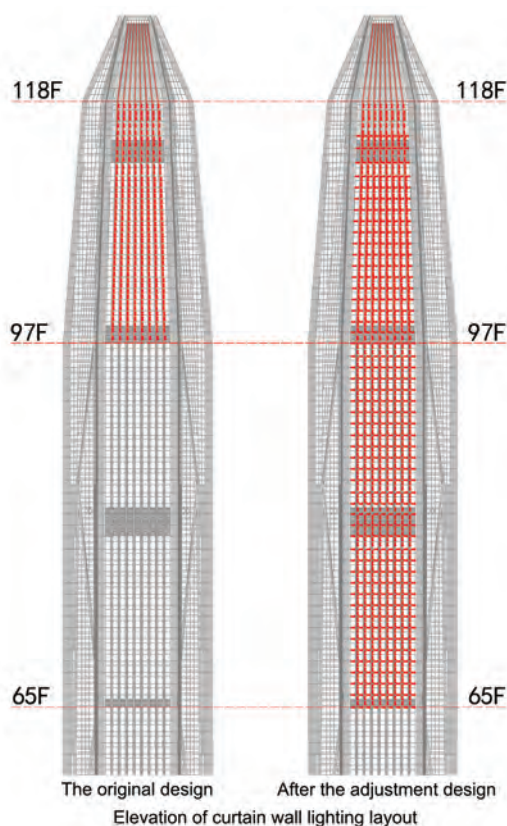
Elevation of curtain wall lighting layout (Source: Beijing Fortune Lighting System Engineering Co., Ltd.)
